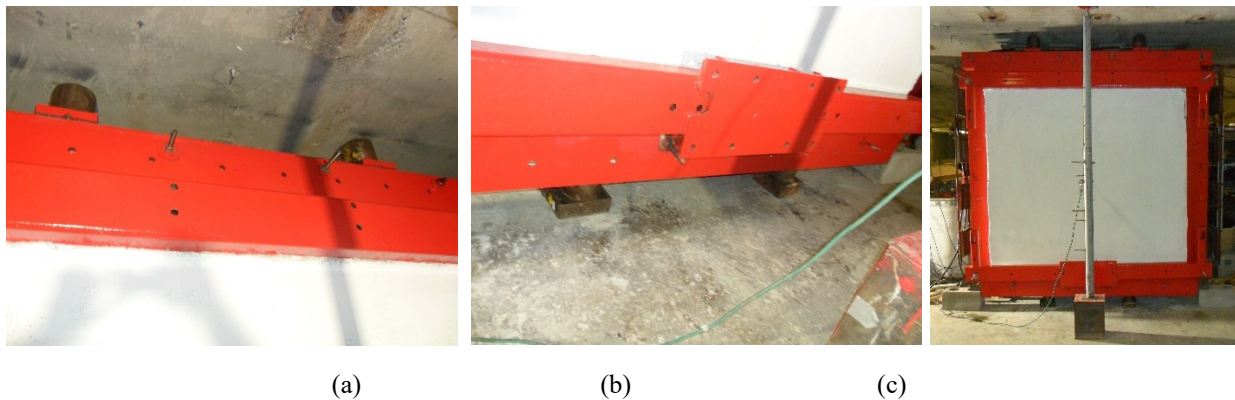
Axial load application on wall; (a) Two hydraulic jacks on the top of the wall, (b) Bottom supports for bottom HSS, (c) Front view of hydraulic jacks and supports.
